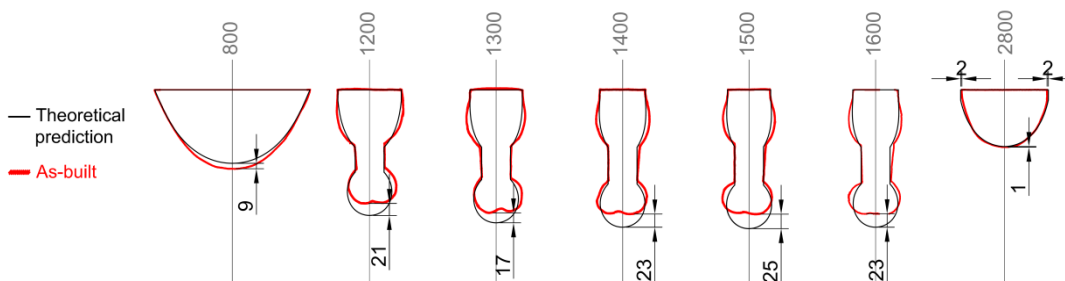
FFB 4 as-built cross sections (all dimensions are in millimetres)
